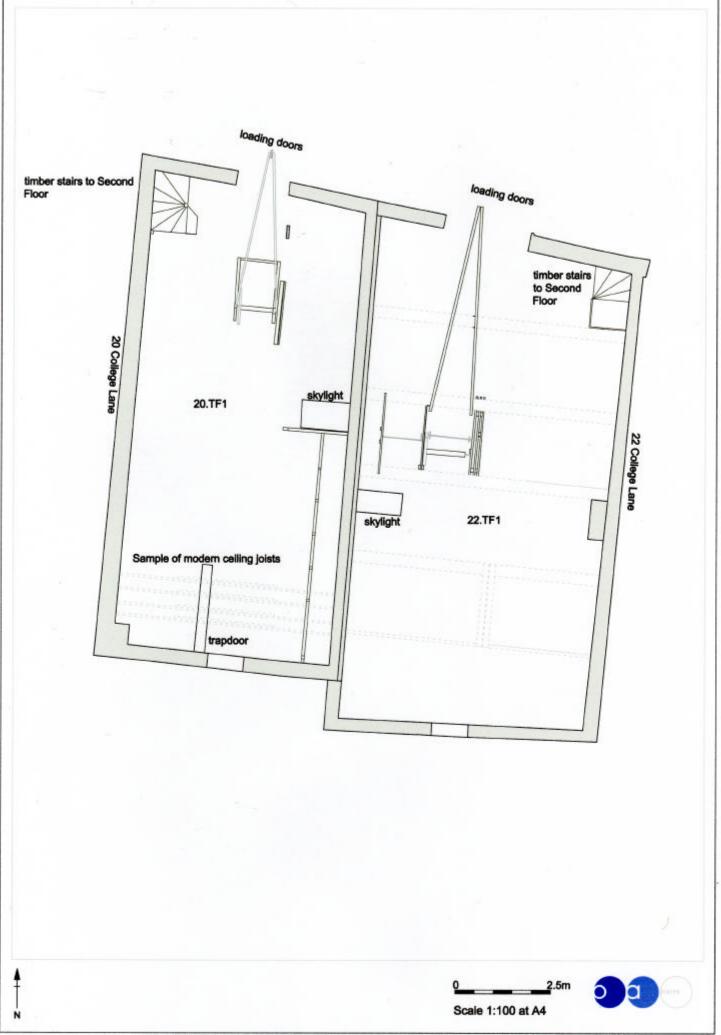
Detailed Plan of 20 College Lane, Third Floor, and 22 College Lane, Third Floor
